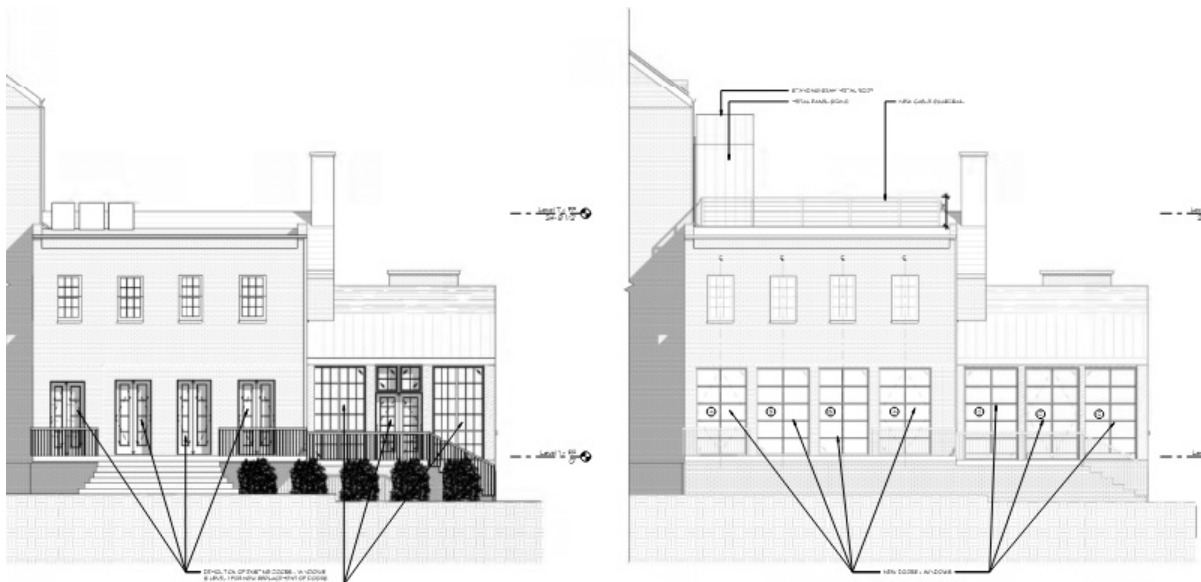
Left: existing south elevation; note that the 3 HVAC units on roof will be relocated and screened. Right: proposed elevation showing roof deck, elevator, and fenestration changes.
